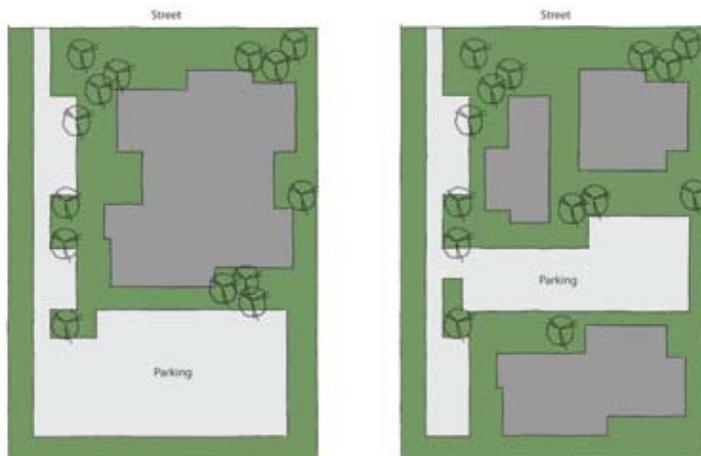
Rather than constructing a single, large building mass (left), consider breaking the building area into several small building masses clustered around a focal point (right).
